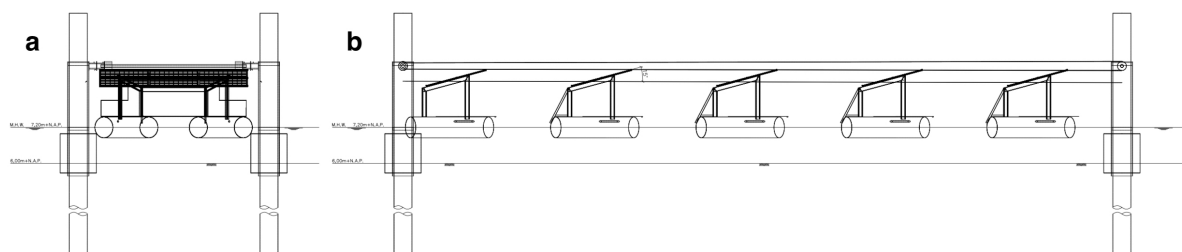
Detailed view of structure 1. a) Front section, b) Side view in operating position
